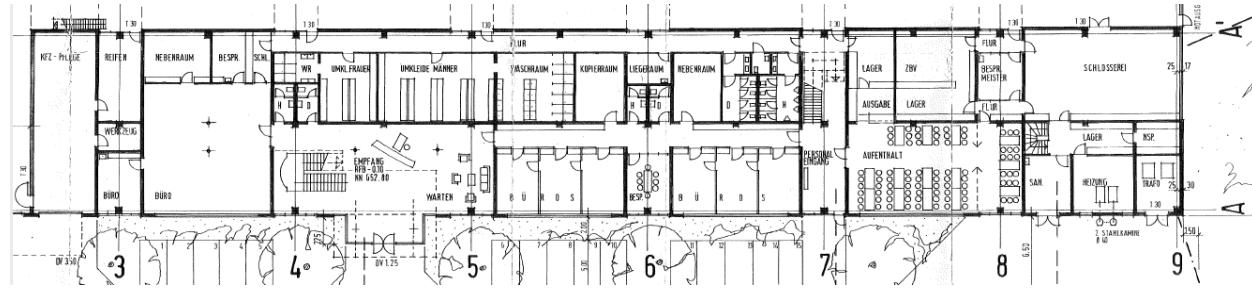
Layout Drawing of the Ground Floor of the Office Section of the Building by Schöne + Seeburger
